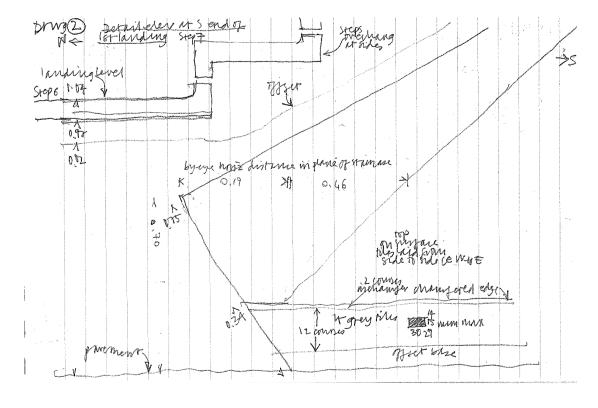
Site working drawing (2): dimensioned sketch elevation of the underside of the steps at the lower landing
